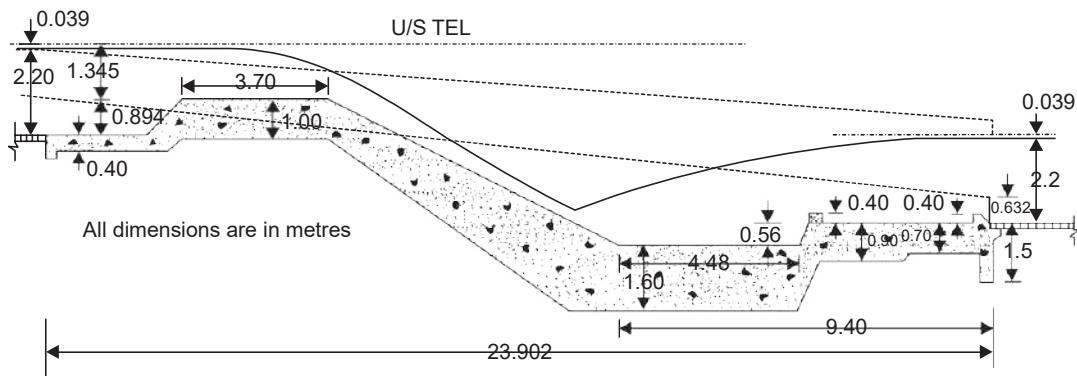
Longitudinal section of glacis fall (Example 10.2) (not to scale)
